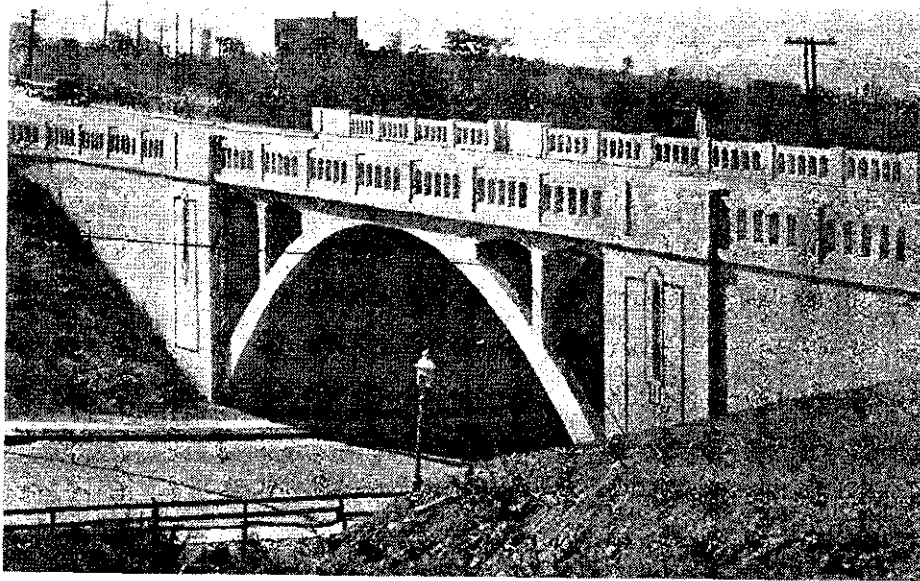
Exposed concrete parkway underpass, Saw Mill River Parkway, Yonkers, N.Y.; Arthur G. Hayden, engineer; Gilmore Clarke, architect (Westchester County Park Commission)
